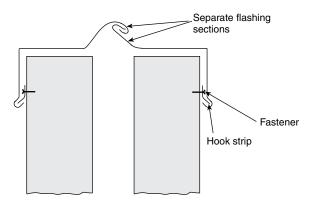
(c) Double fire wall — separate flashing sections.
